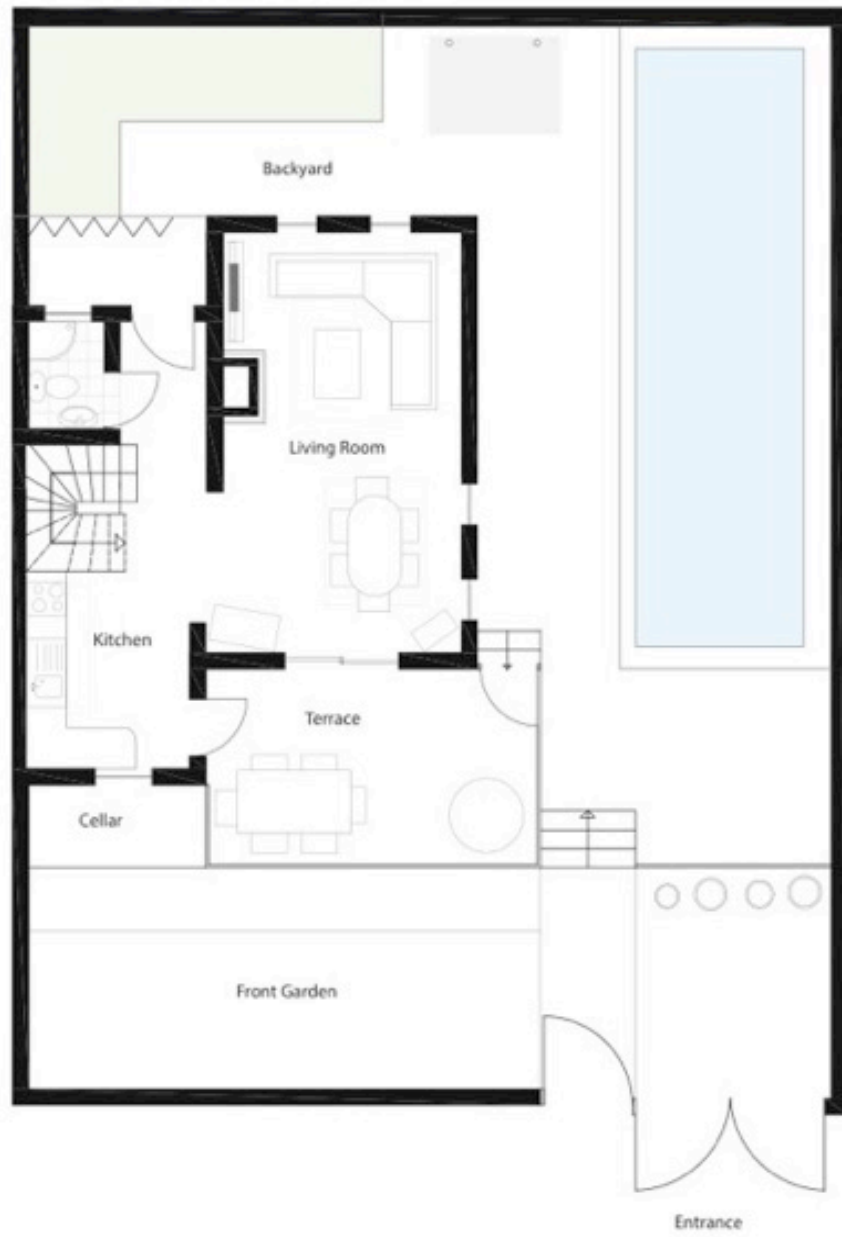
Ground floor plan of Kuşadası House (the drawing is not to scale).
